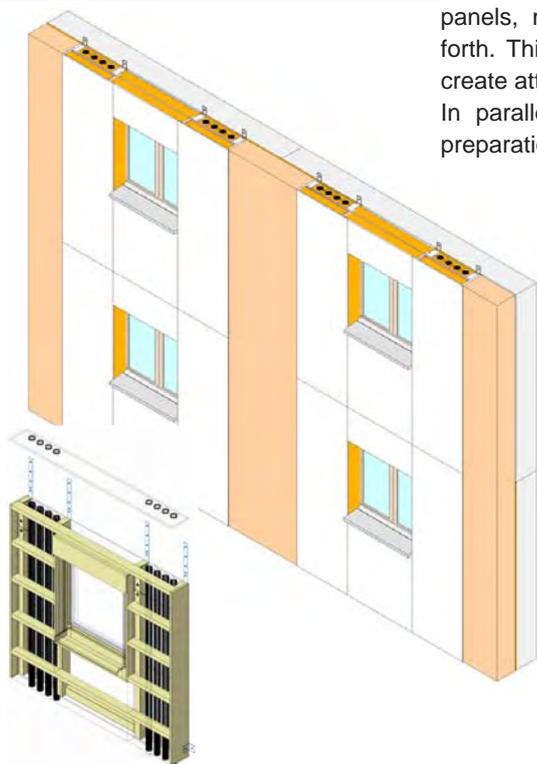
Façade modules produced precisely to size and mounted onto the façade with the spaces between the modules traditionally insulated. (Inset: façade module showing integrated ventilation ducts.)
